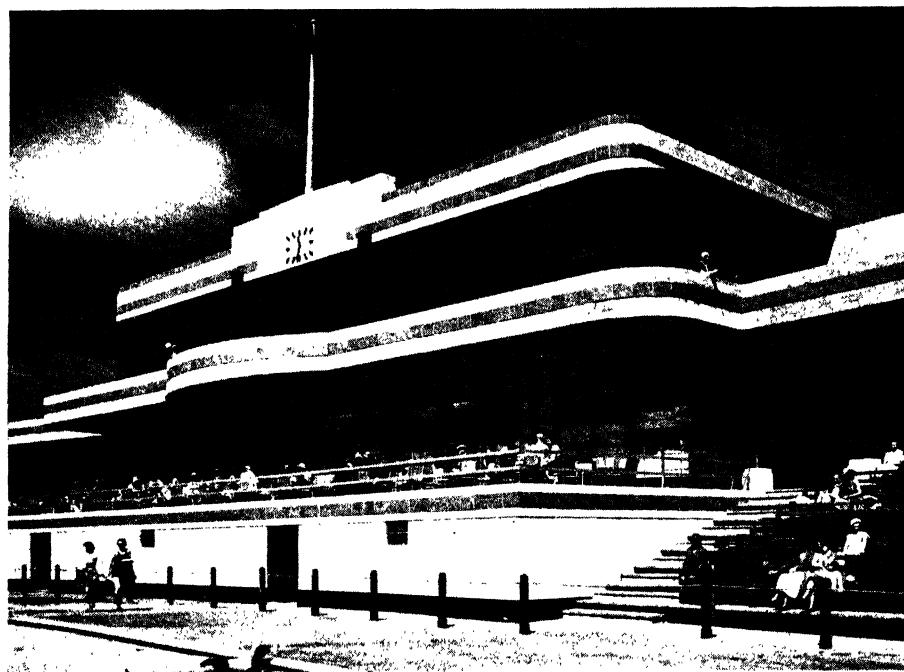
CAFÉ AND TEA TERRACE, NEW BRIGHTON BATHING POOL, EMBODYING THE USE OF REINFORCED-CONCRETE BALCONIES AND CANOPIES CANTILEVERED OUT FROM THE MAIN WALLS
